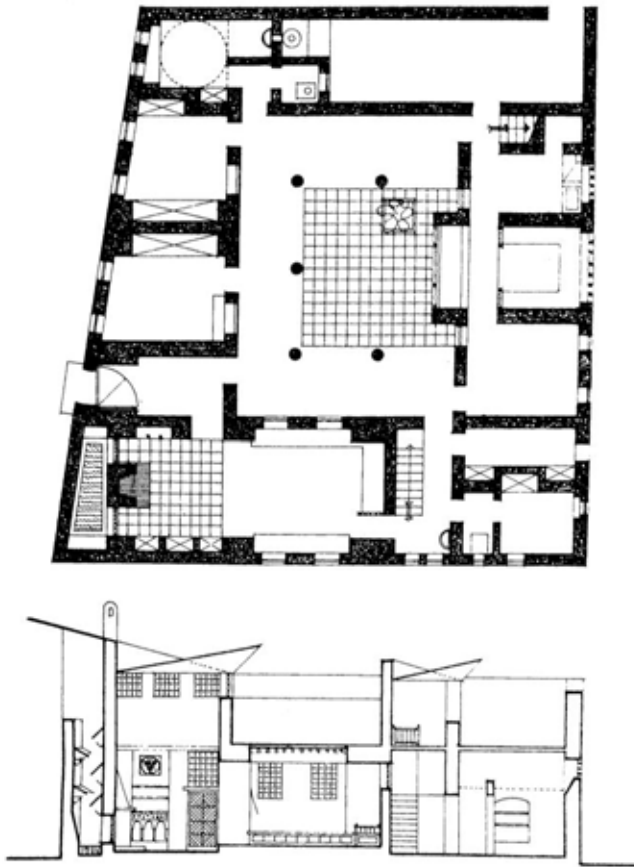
Model House at El-Dareeya, 1975, Plan and Section [2]
